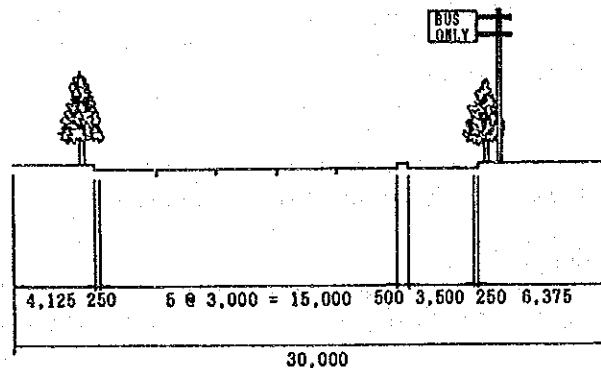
Proposed Typical Cross Section of 6a and 7a Ave.
